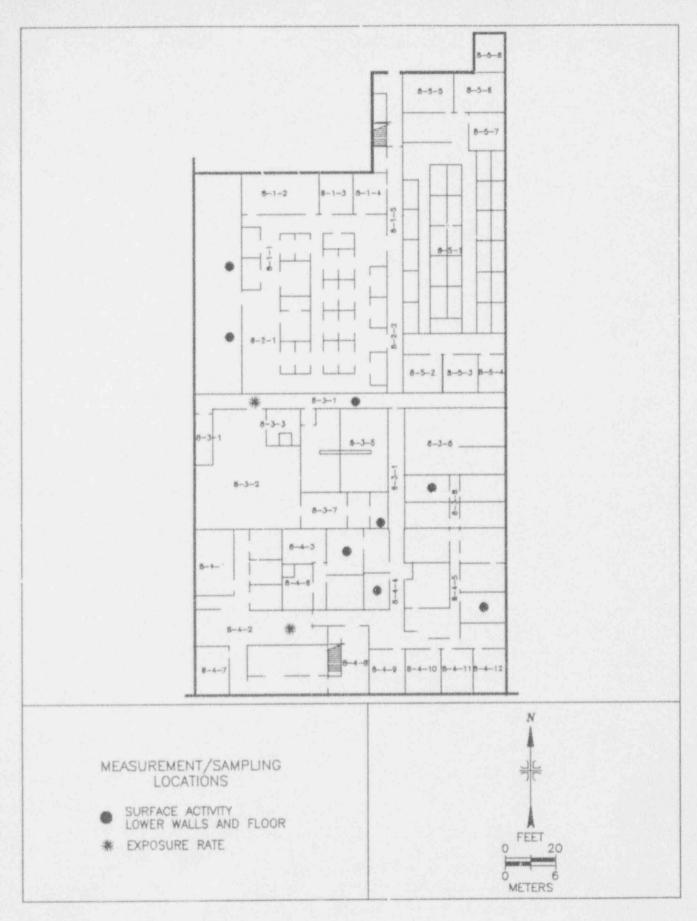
Building 8A, First Floor - Measurement and Sampling Locations
